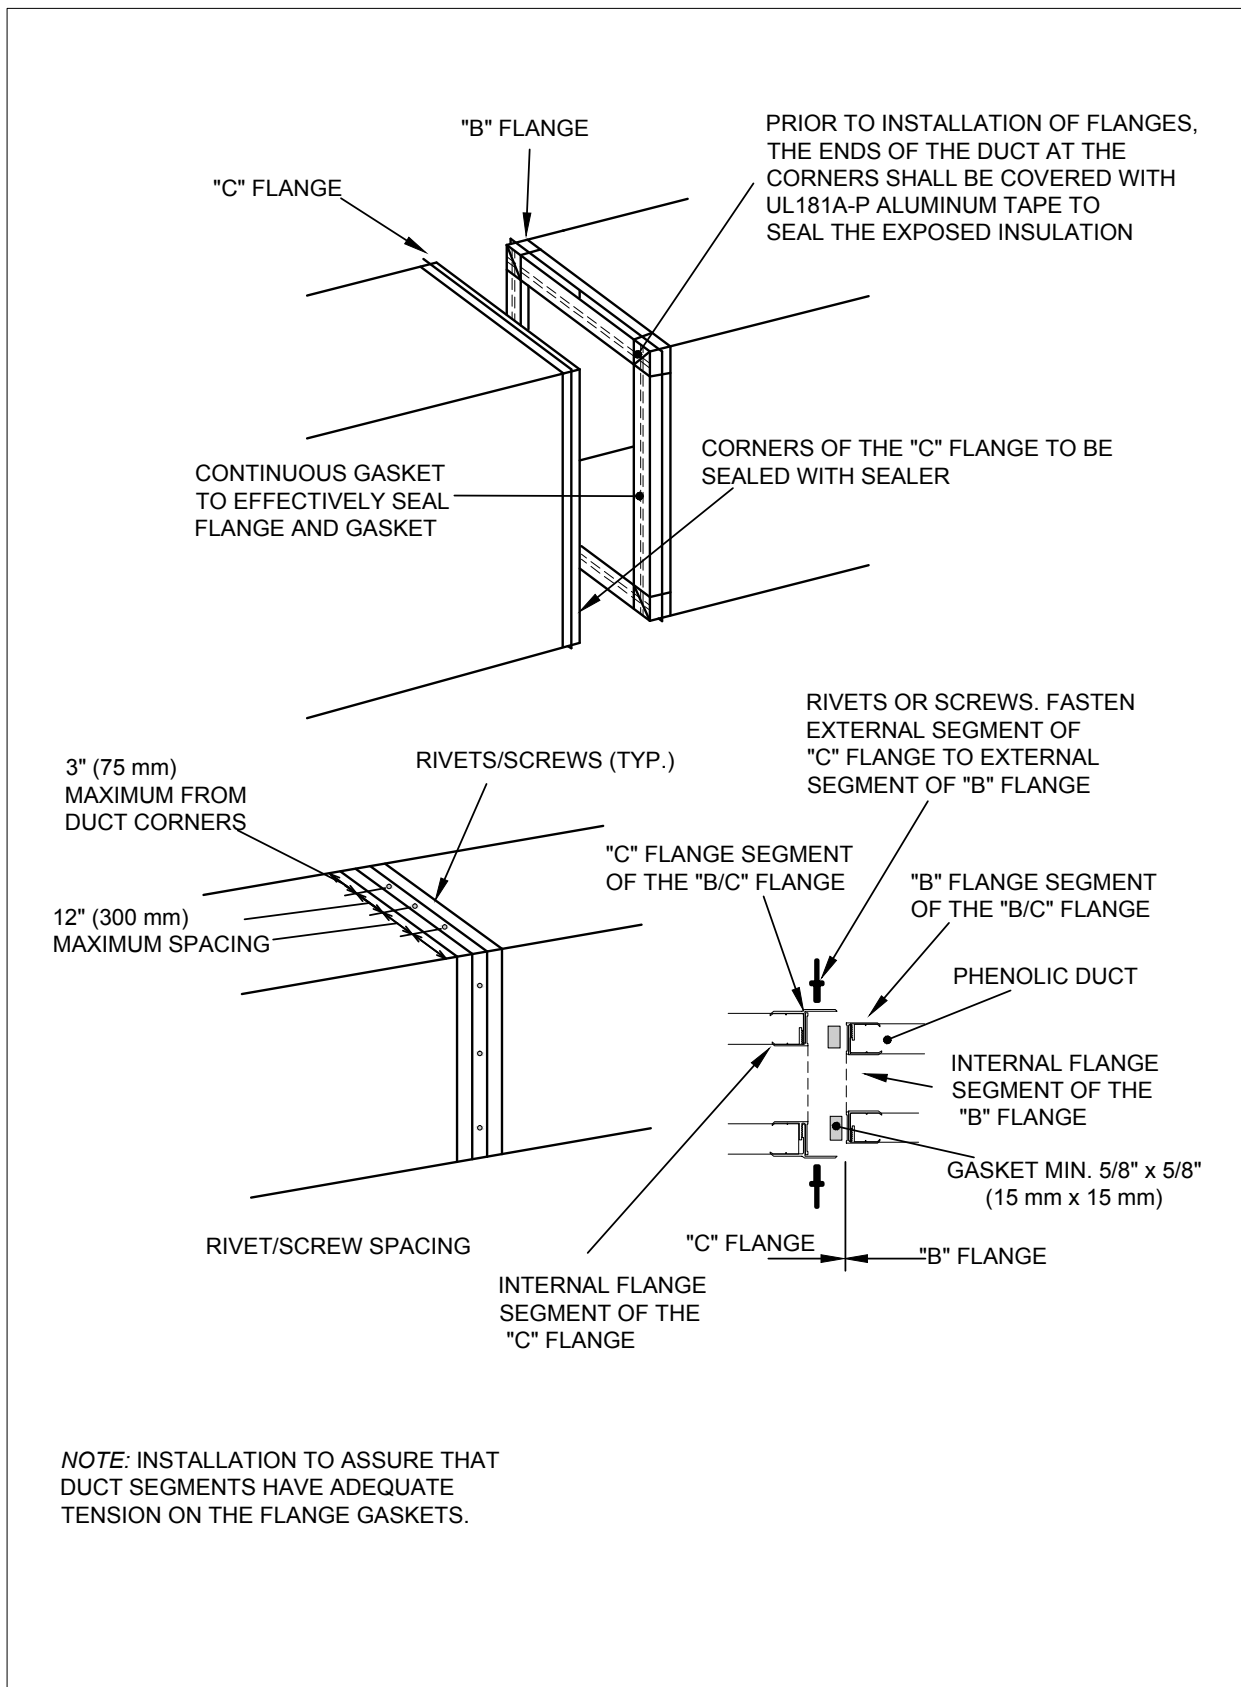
CLOSURES – OPTIONAL "B/C" FLANGE
